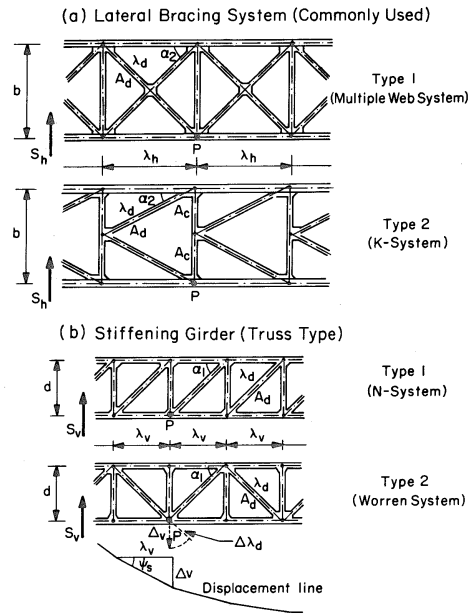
Commonly used lateral bracing systems and stiffening girders
